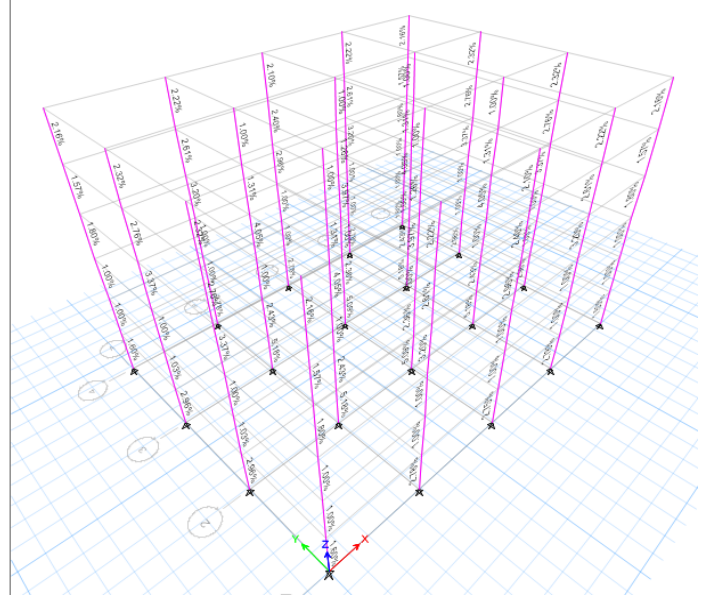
Output Design of the 6-Story Structural Building Showing the Required Reinforcement Area (mm) with Beam A (40cmX55cm), Beam B (30cmX50cm).
